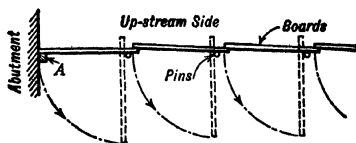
Plan of Flash-boards Designed for Progressive Failure.
